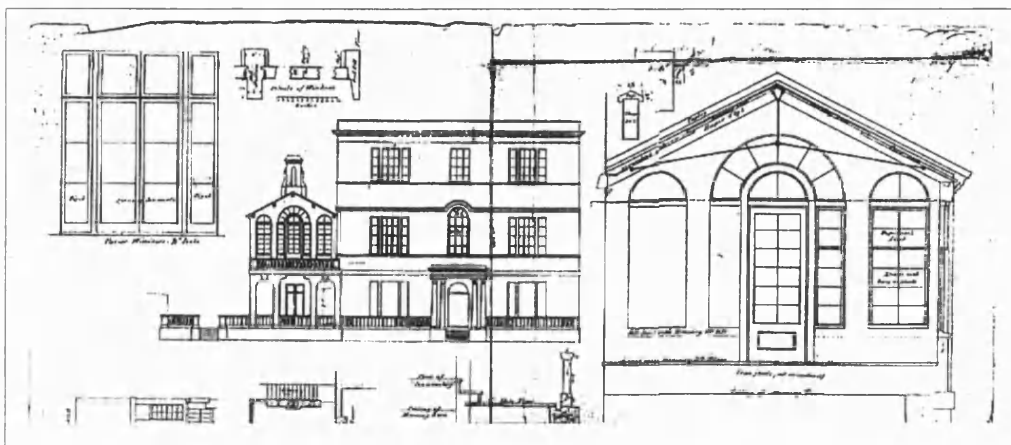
Winifred House, 1852. Proposed conservatory and balcony over morning room. Detail from working drawing. Signed Manners & Gill, Architects, June 1852. In addition to interest in this Victorian conservatory design, the elevation of Winifred House possibly provides a unique survey record of the principal elevation of a fine house.
